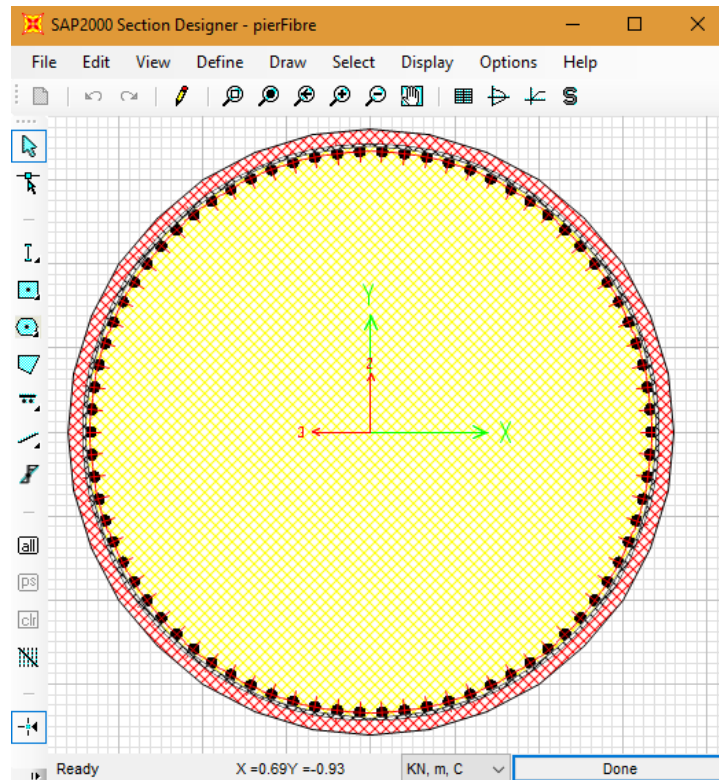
(a): Long Column Section Designed as per IRC:6-2000
